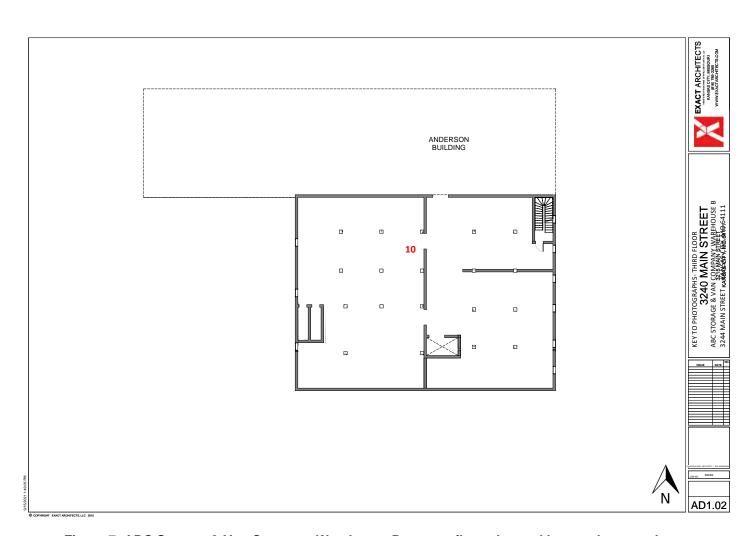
ABC Storage & Van Company Warehouse B current floor plan and key to photographs, third floor.
